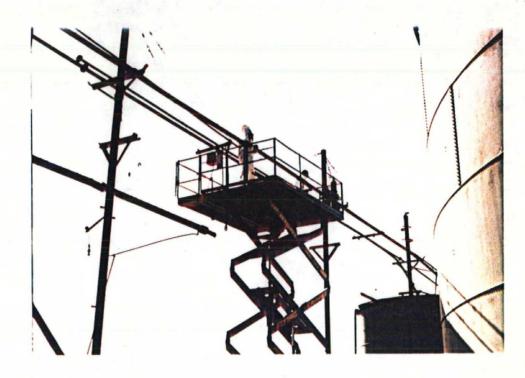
Cutting Aerial Piping-D-Farm. 4/17/85
